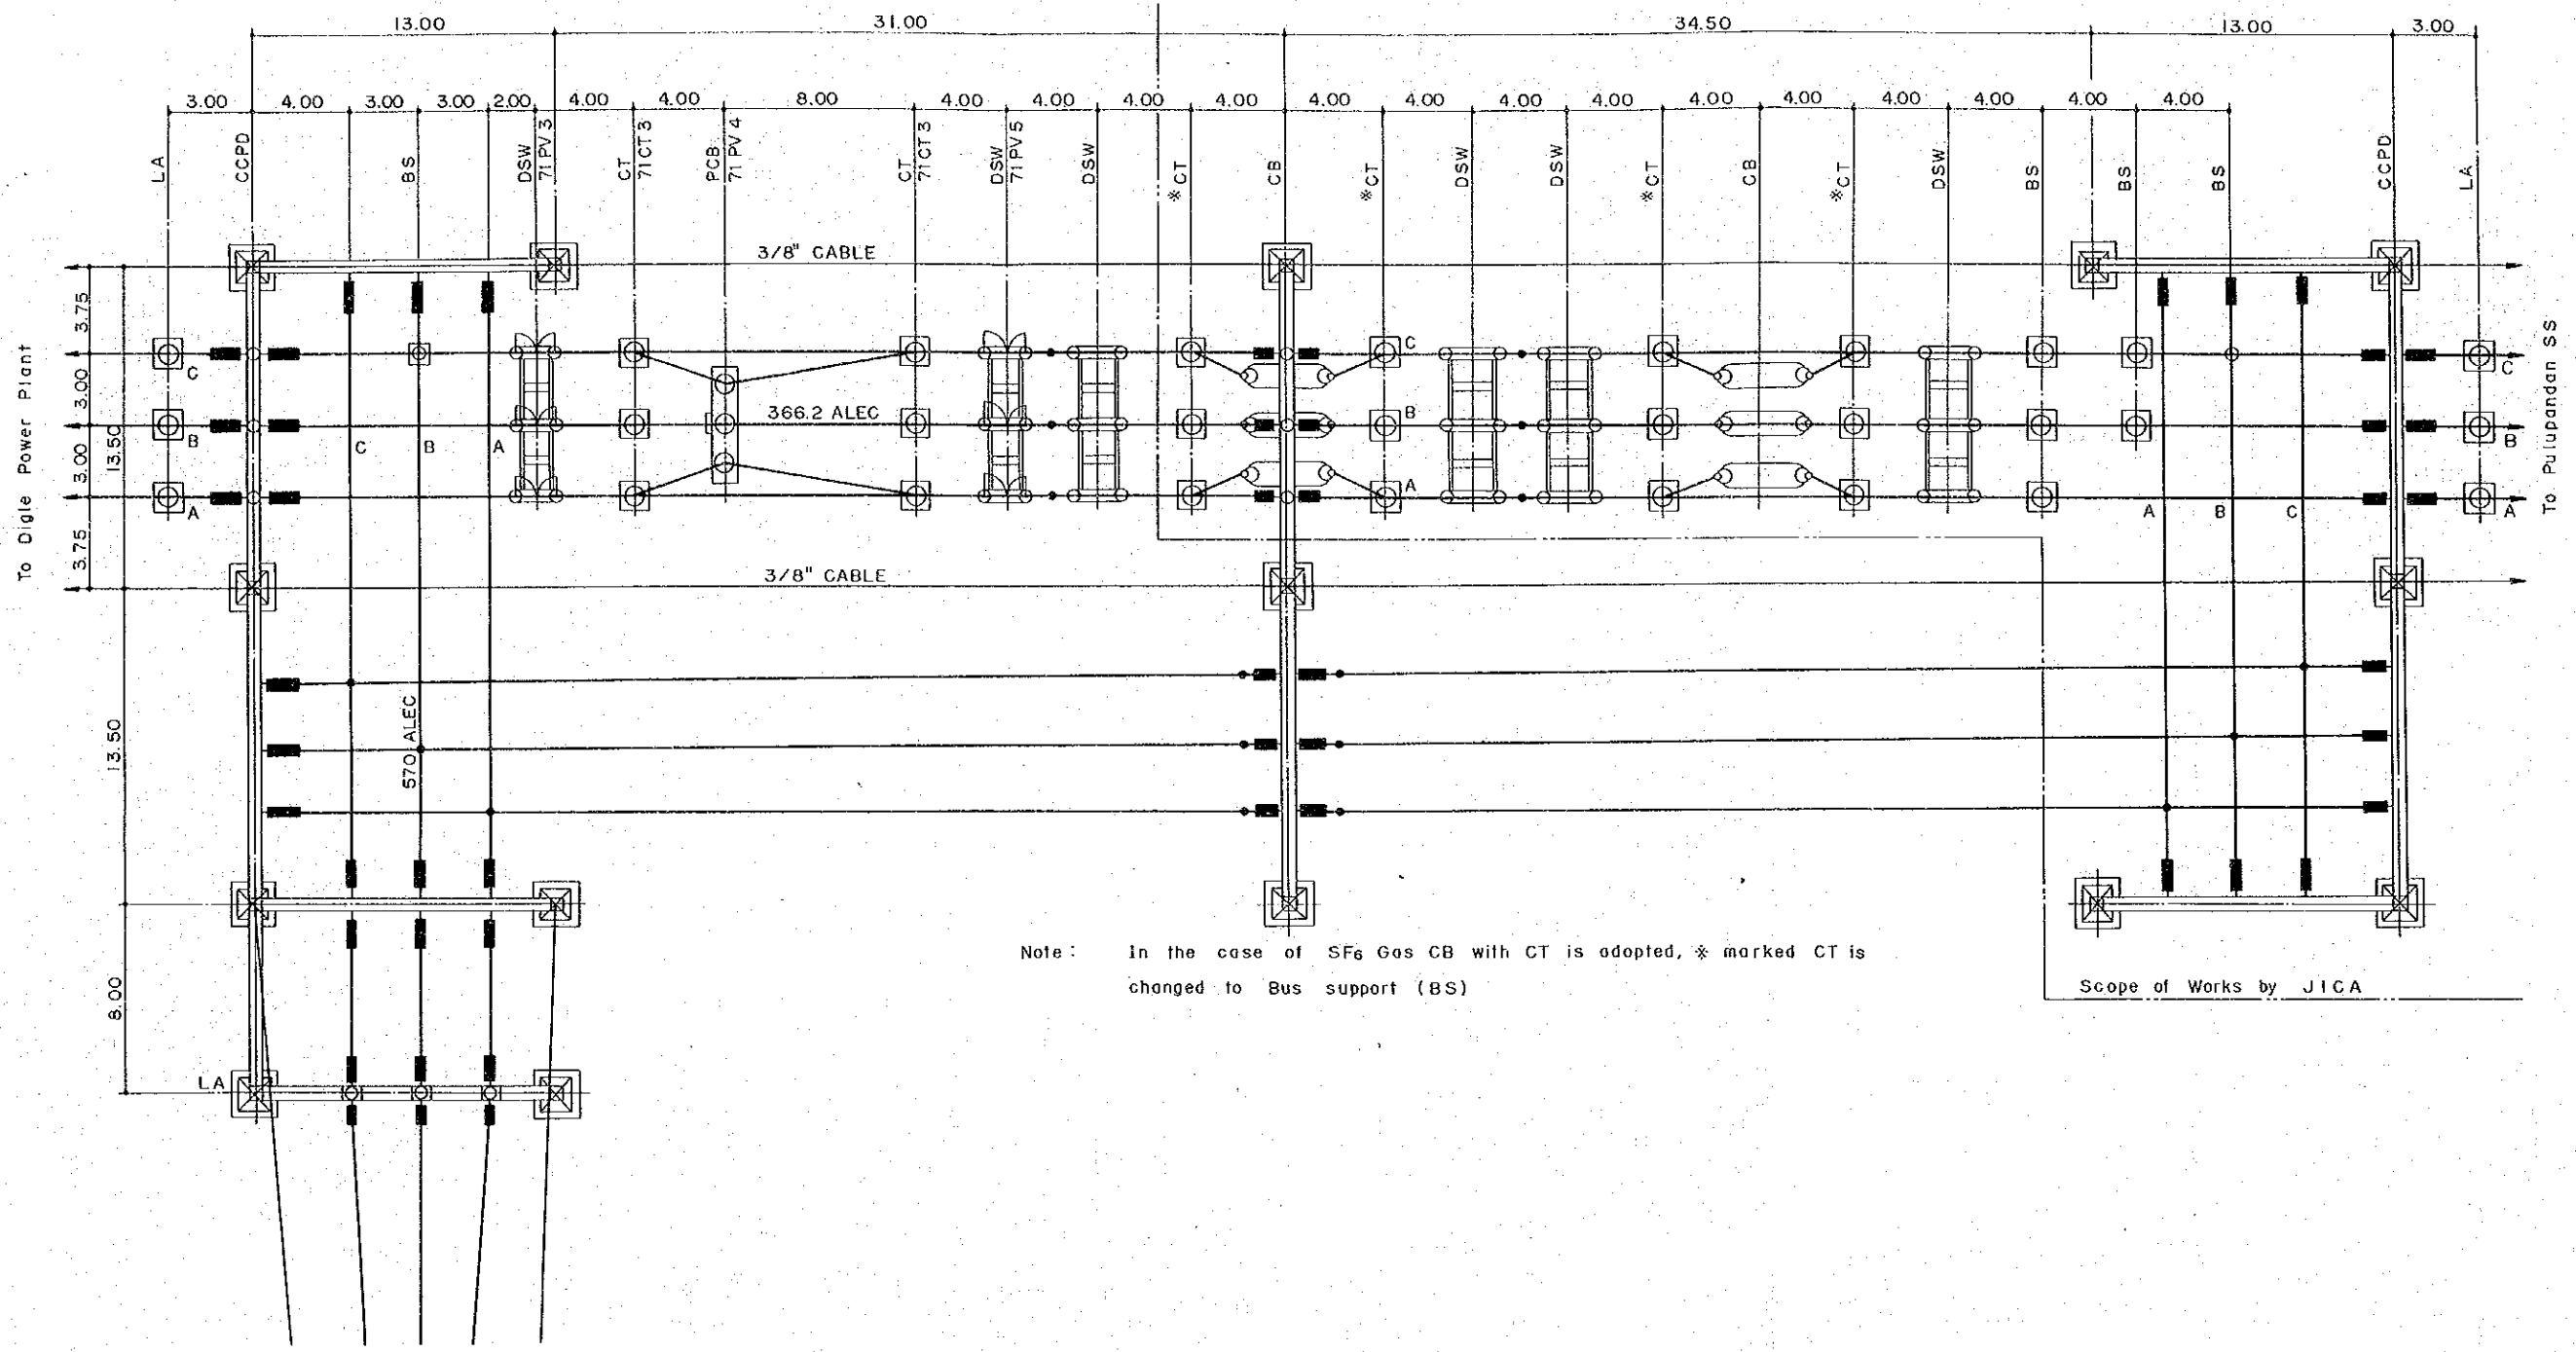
Sta. Barbara Substation Enlargement Plan (Refer to NAPOCOR Original Drawing)
